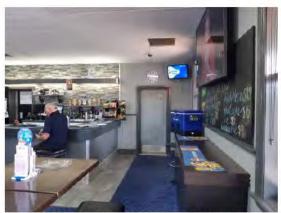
| Bar looking N. Door and wall to be partially removed. 300mm nibs to be retained to indicate former layout.
